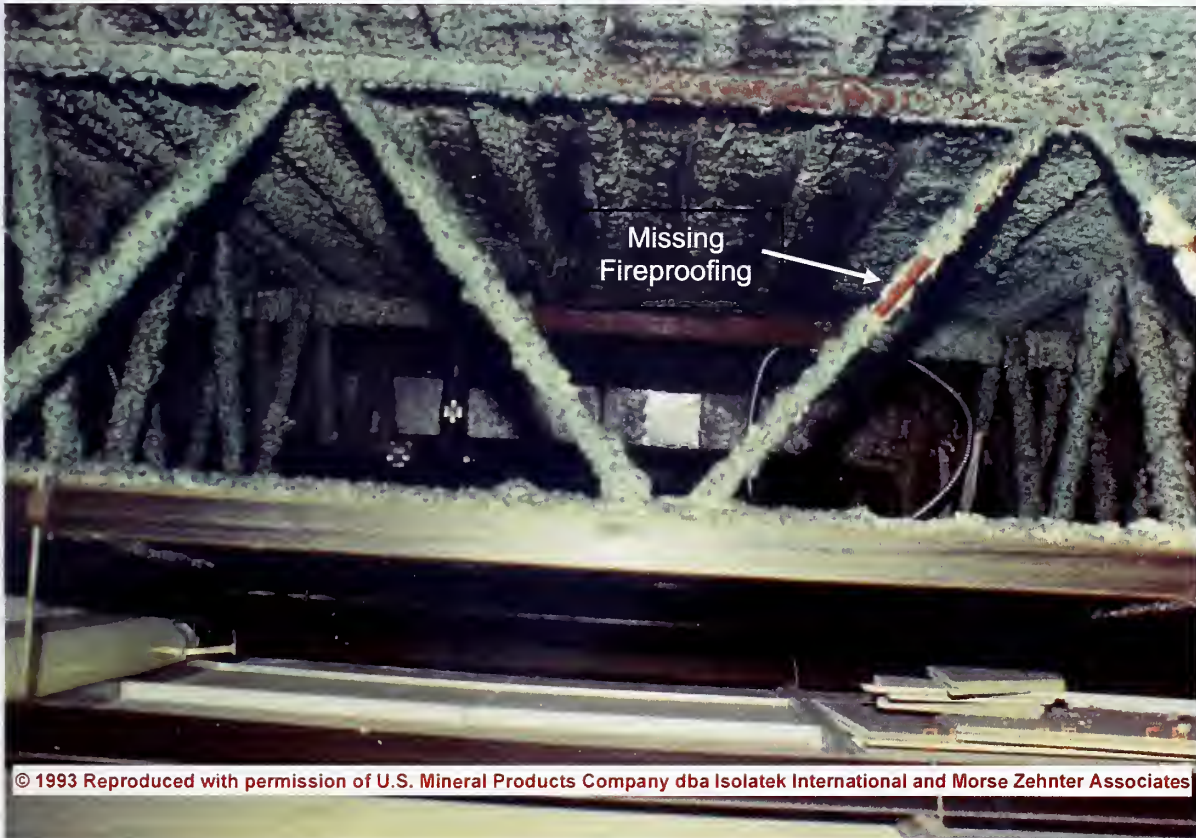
Example of “gap” in fireproofing on diagonal member of a bridging floor truss.
